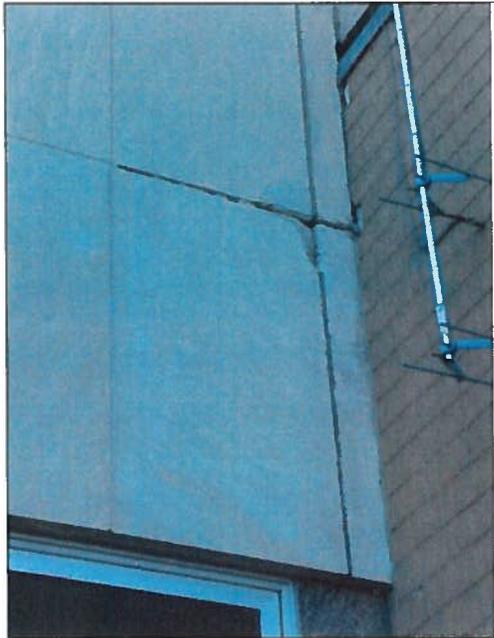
Deteriorated mortar joint at garage wall intersection
